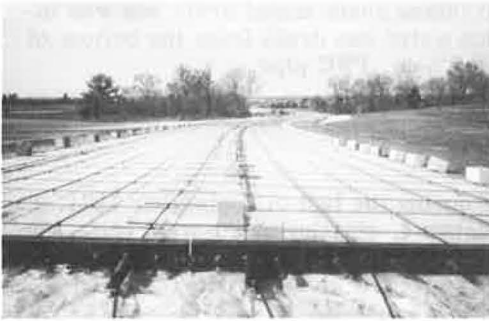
Supplemental I-beams shimmed to proper opening and elevation just prior to concreting.
